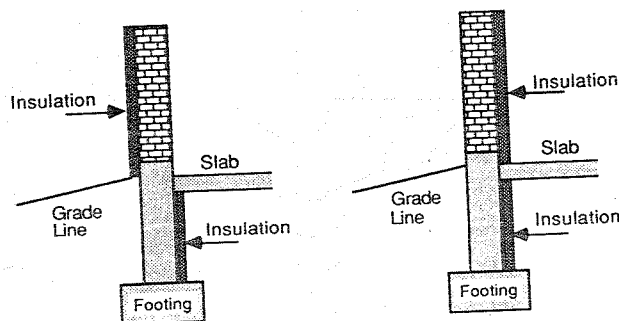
Examples of insulation added to slab floors and footings which form thermal bridges.
